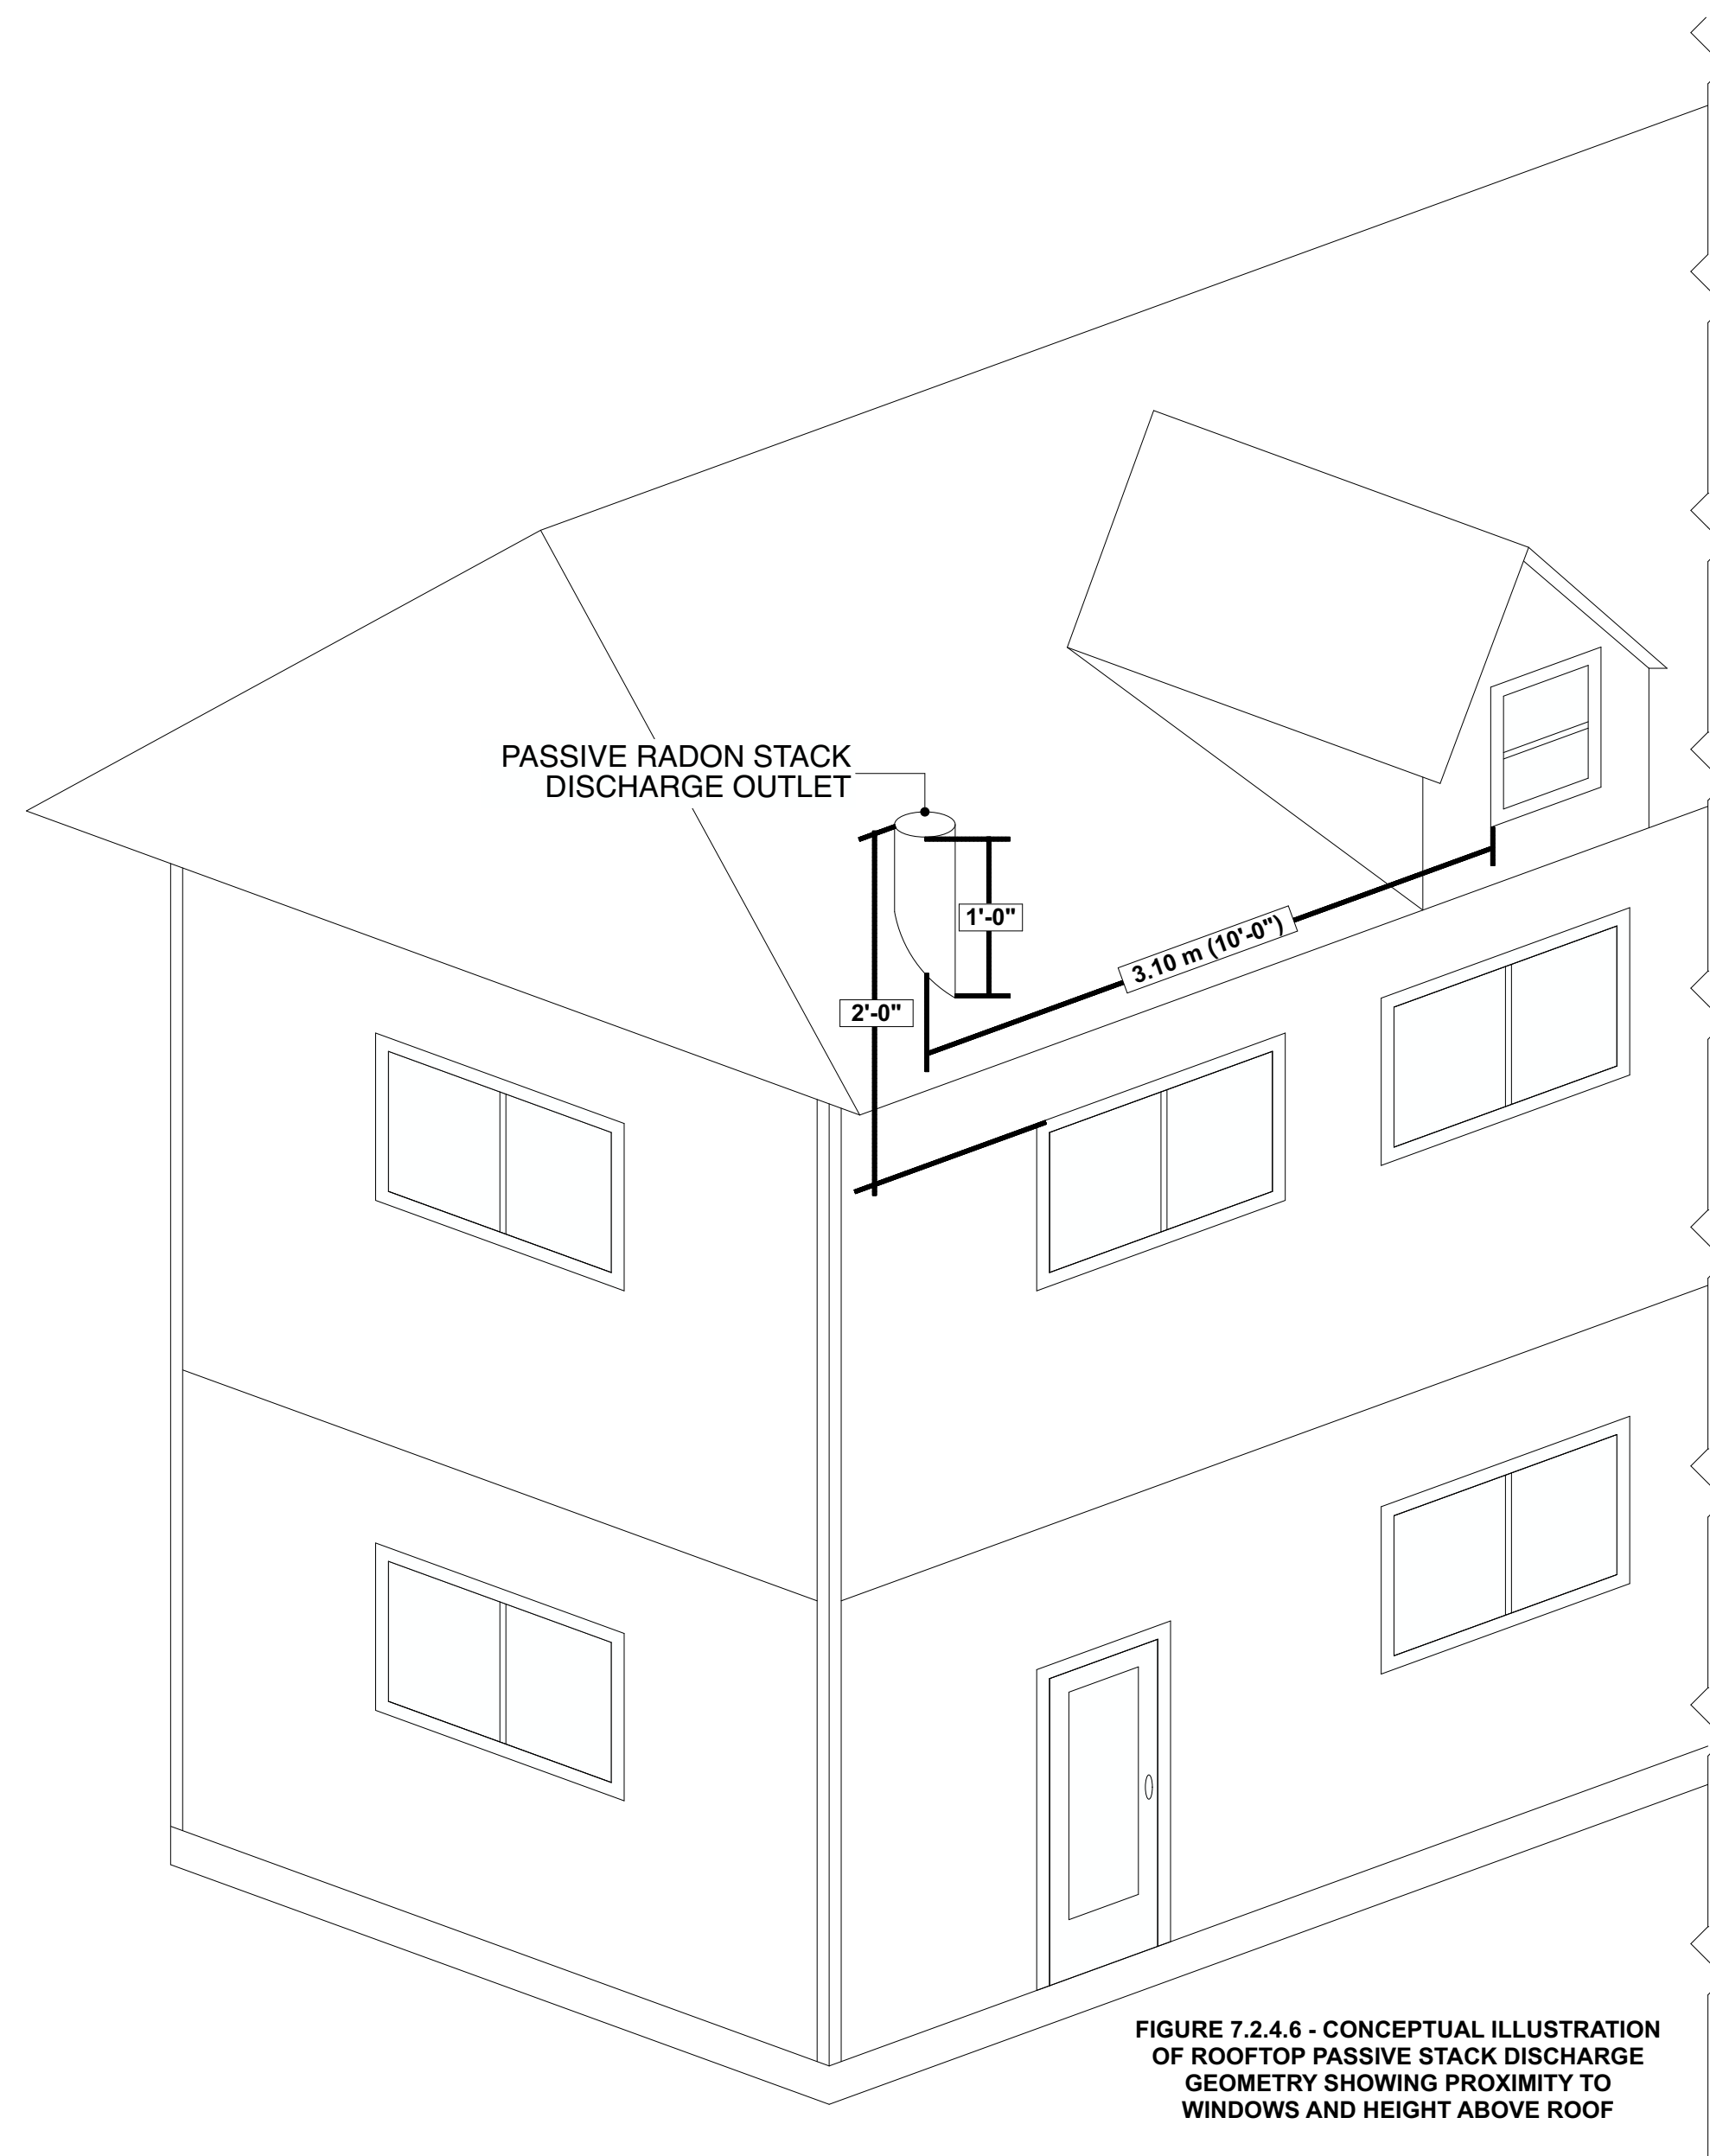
CONCEPTUAL ILLUSTRATION OF ROOFTOP PASSIVE STACK DISCHARGE GEOMETRY SHOWING PROXIMITY TO WINDOWS AND HEIGHT ABOVE ROOF
